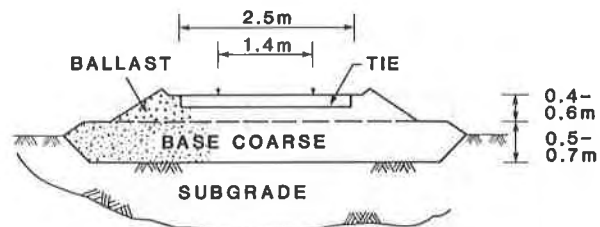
TYPICAL EUROPEAN TRACK SECTION
